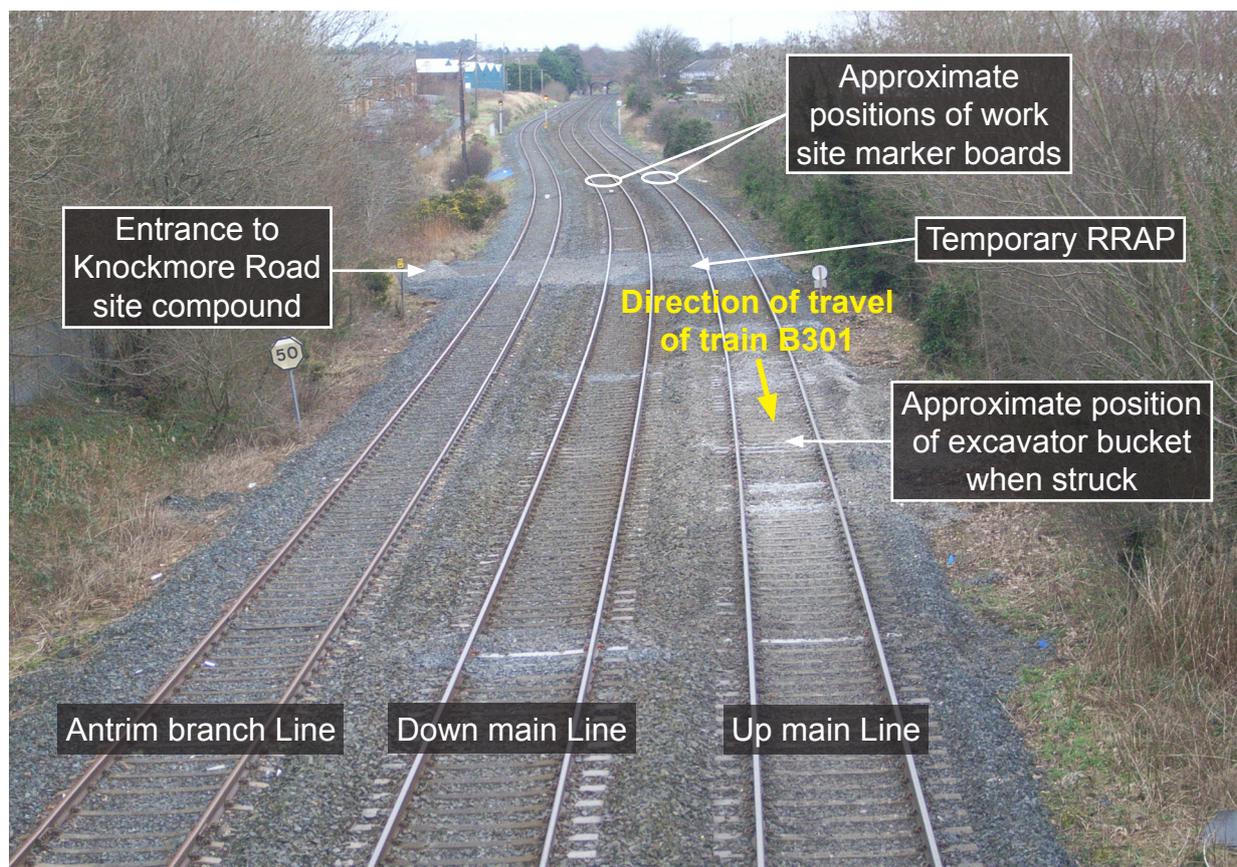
RRAP and worksite marker board location near Knockmore Road site compound
